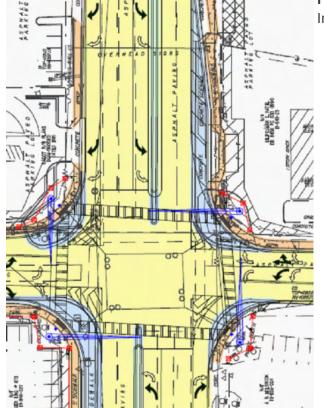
Design Plan, Intersection at Hurt Road
